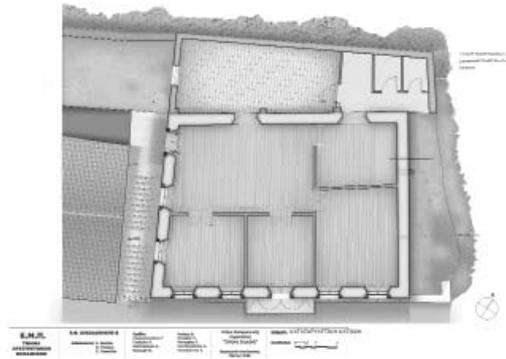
The "Philharmonic Orchestra" building. Ground Floor Plan.
